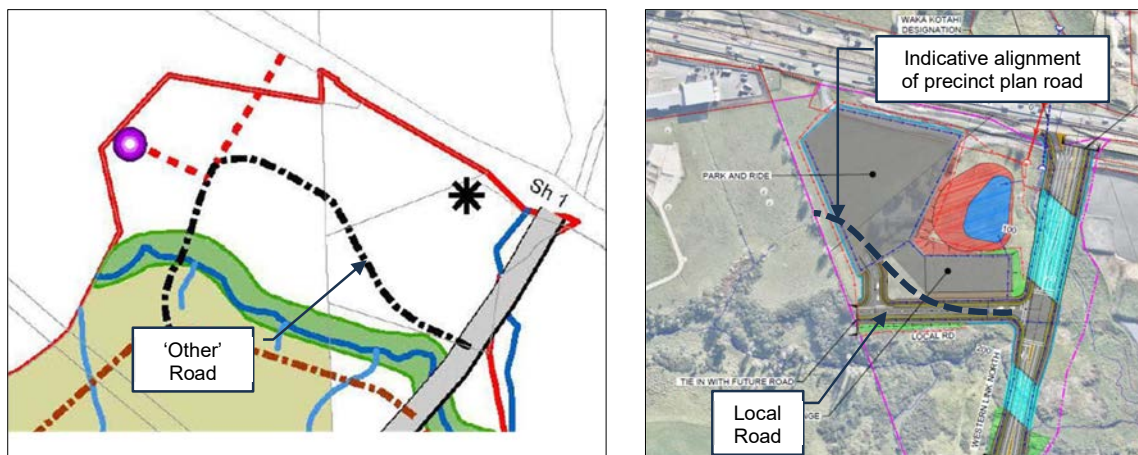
Road alignment for Warkworth North Precinct (left) and NoR (right)
